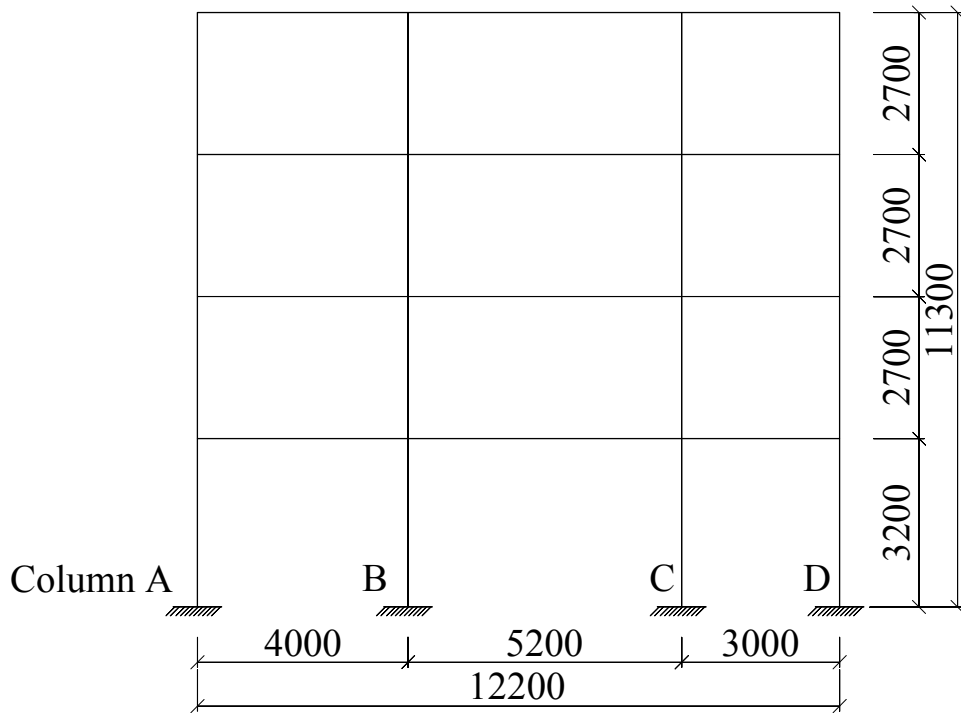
Elevation view of the 4-story sub-frame (dimension in mm)
